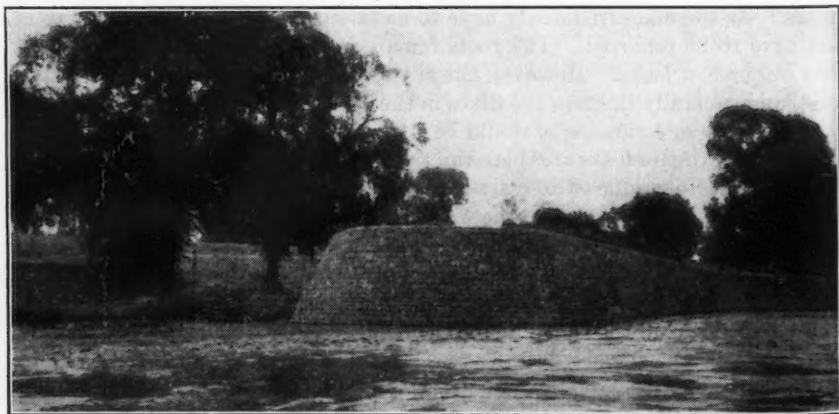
WELL BUILT STONE-PROTECTED GROIN POINTING DOWN STREAM ALONG SOUTH BANK OF
